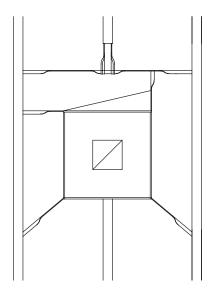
Chimney with direct connection of the panel (as made for the ridge connection with vertical upstand) – suitable from $\geq 3^{\circ}$ roof pitch
